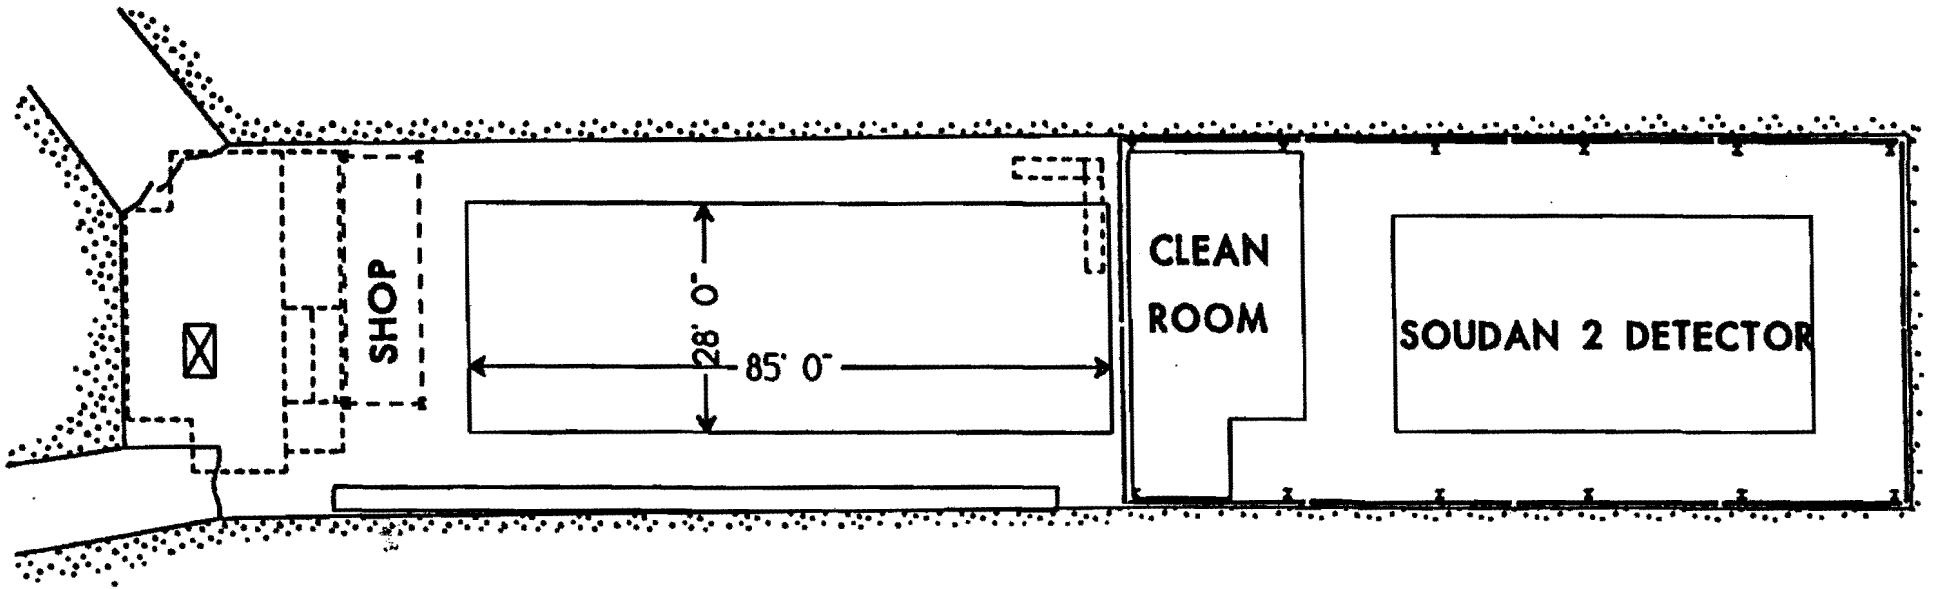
Floor plan for the Soudan 2 laboratory
